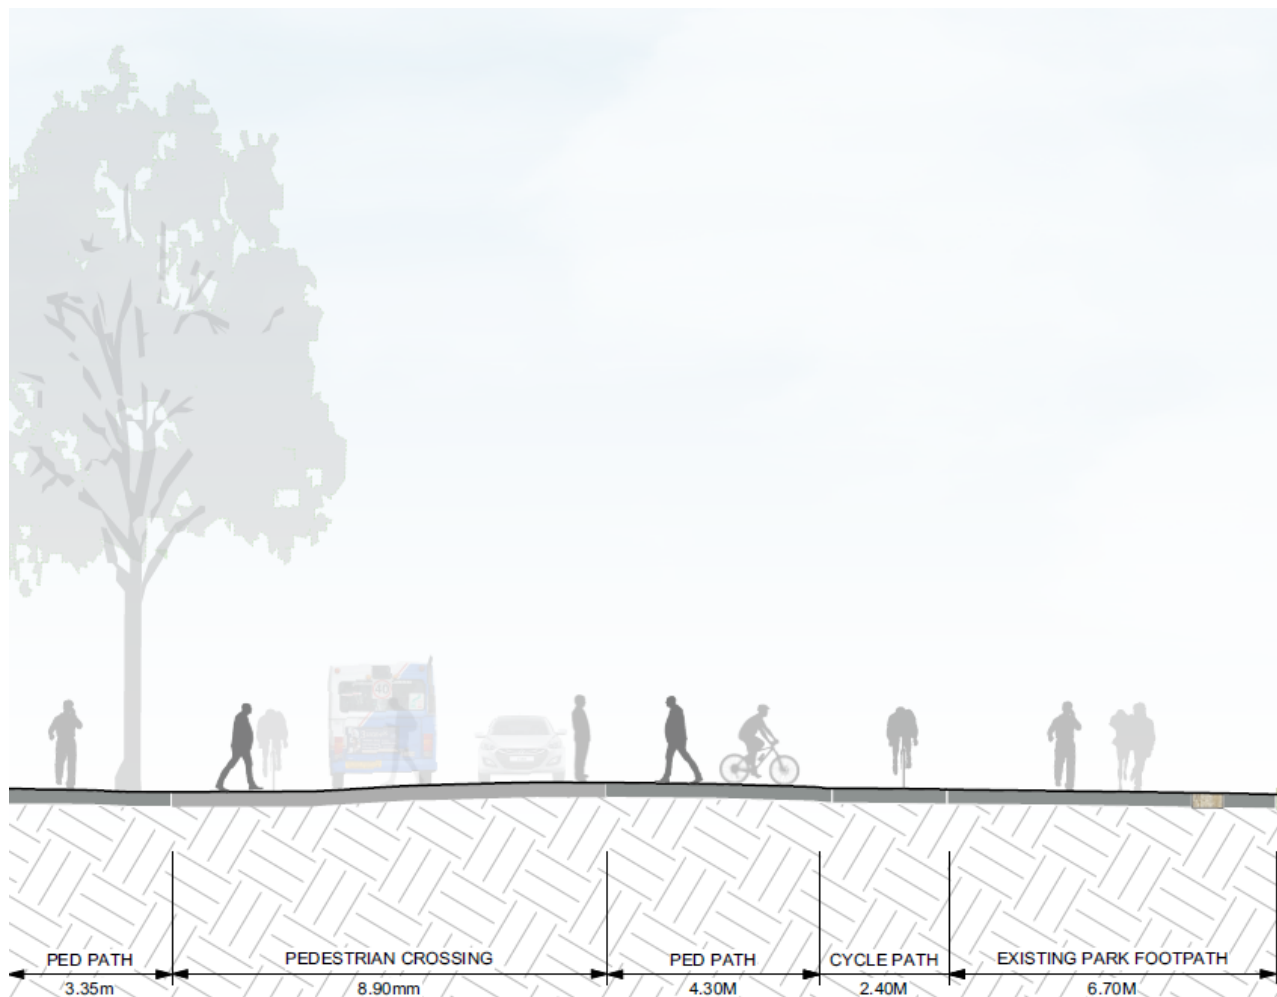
Cross section – Alfred Street South, at proposed crossing
